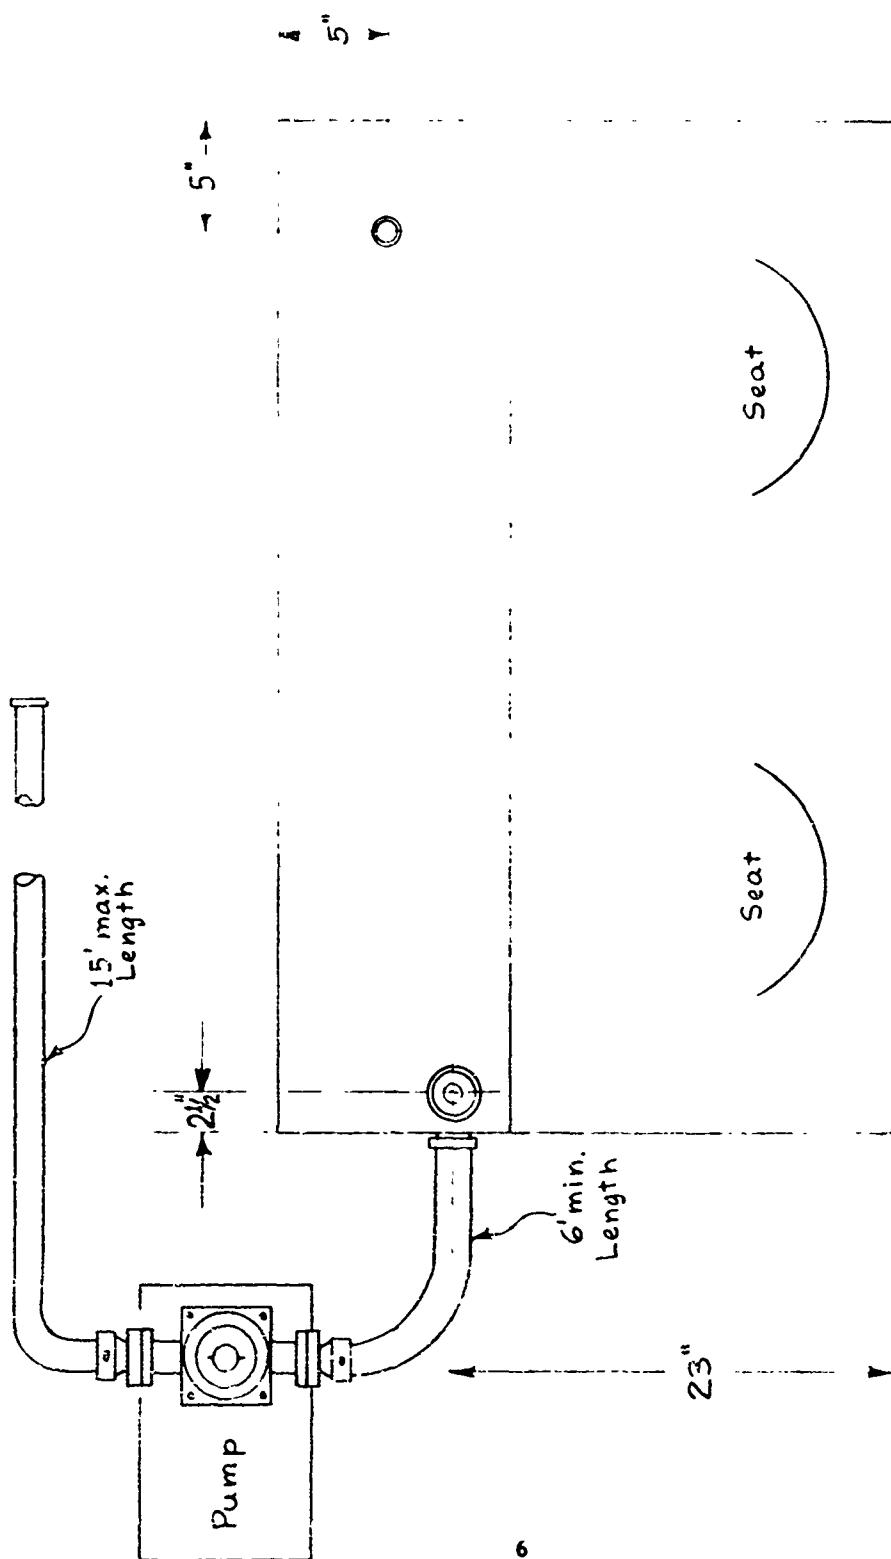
Top-View of Vault and Diaphragm Pump Assembly.
